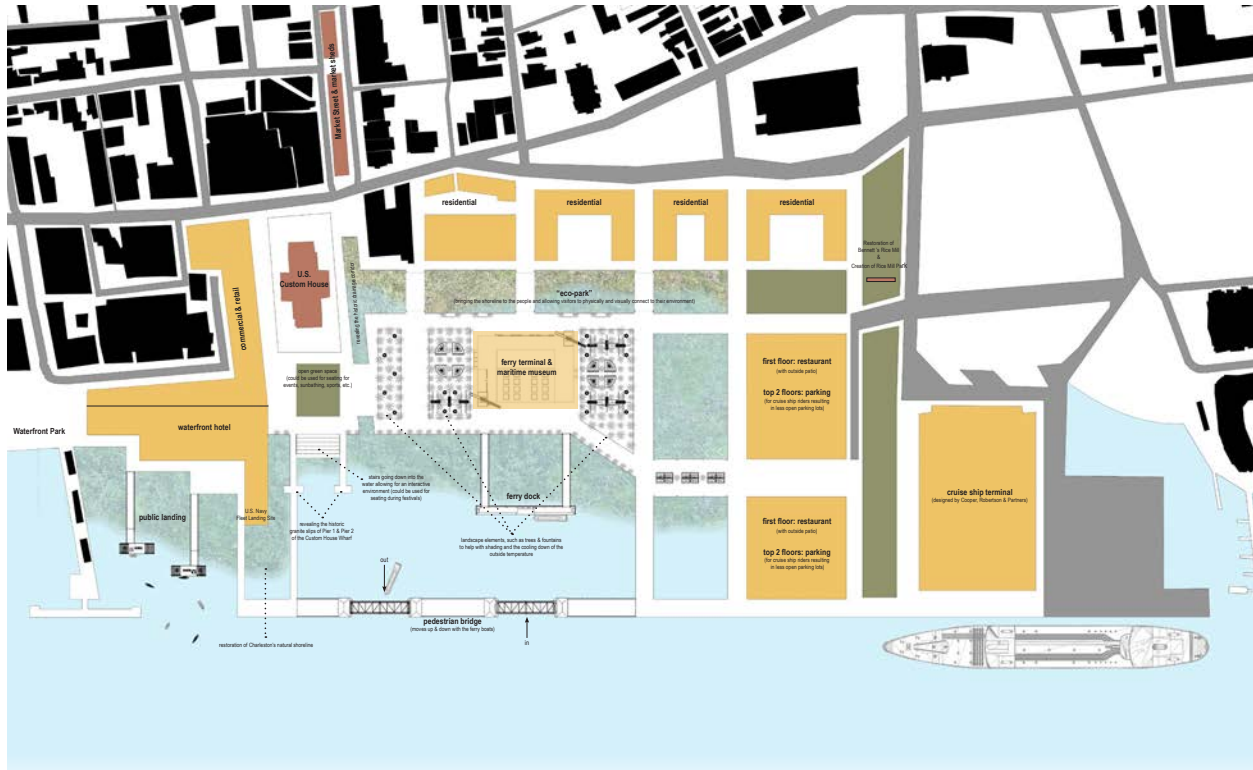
Plan diagram showing newly proposed of Union Pier Terminal.
